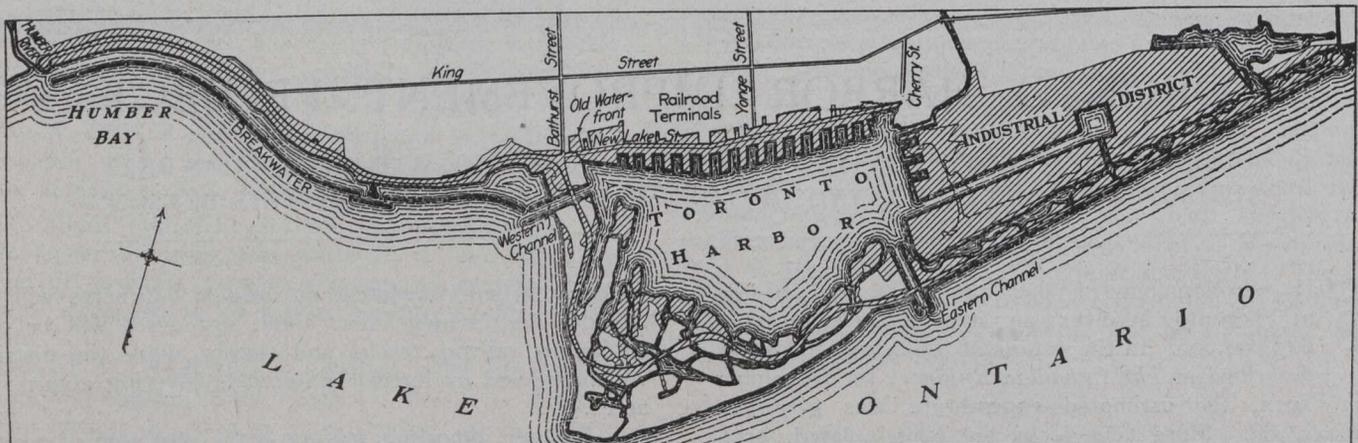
General Plan of Improvements Under Way. Hatched Portion Indicates Reclaimed Areas.
